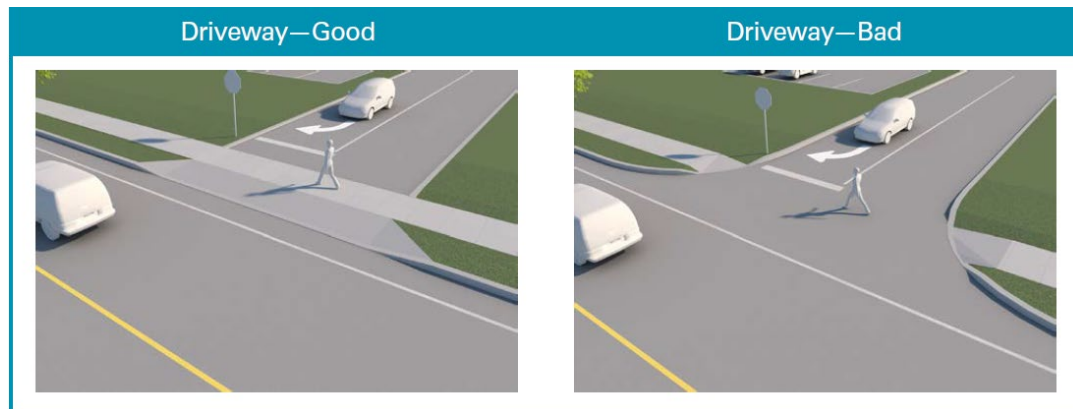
Sidewalk and Driveways (Source: CSDG)
